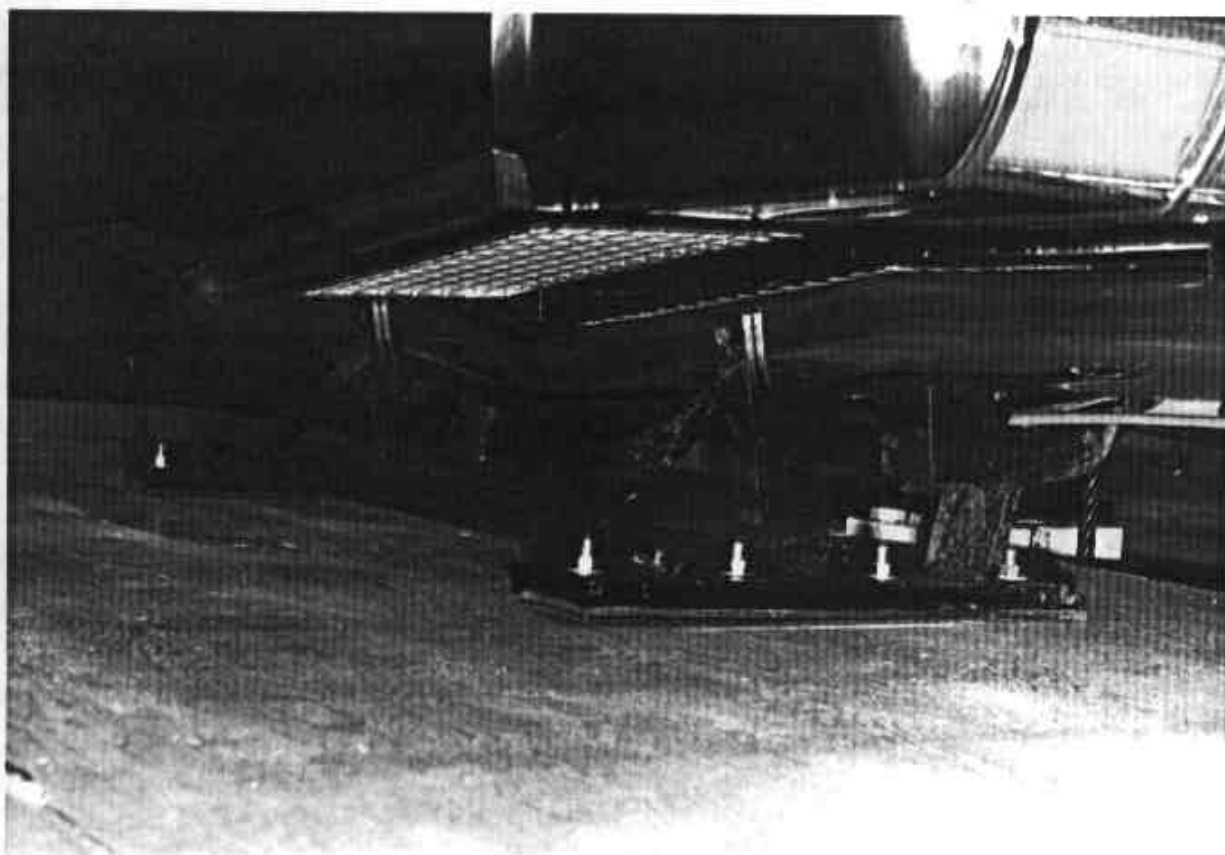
TESTS 840608A AND 840608B PRE-TEST - VIEW 2
